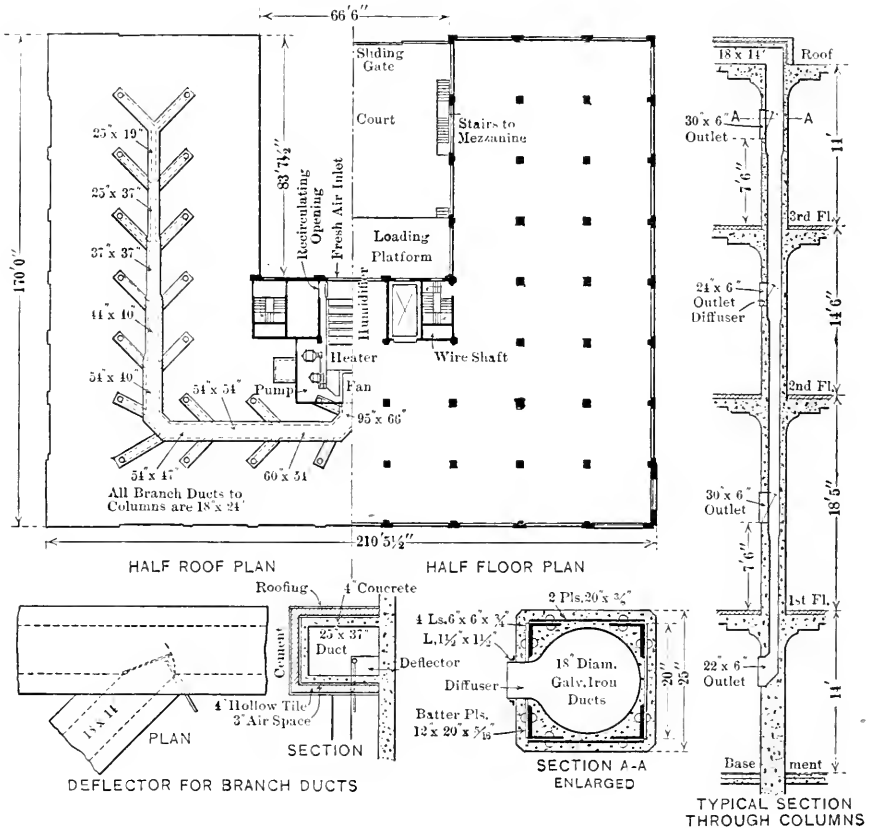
FACTORY SYSTEM WITH FAN AND HEATER ON ROOF. DUCTS IN HOLLOW COLUMNS.
